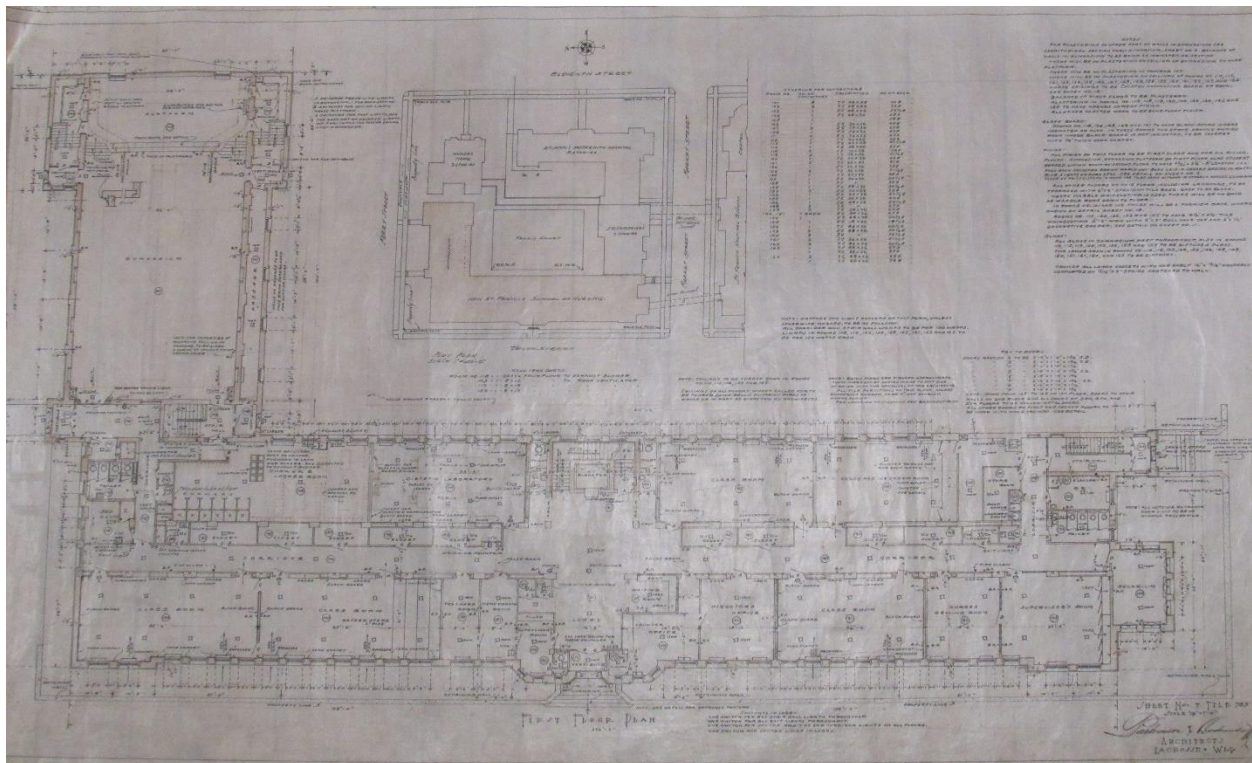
Original construction documents. “First Floor Plan” & “Plot Plan” Sheet 7. 1 April 1941.
